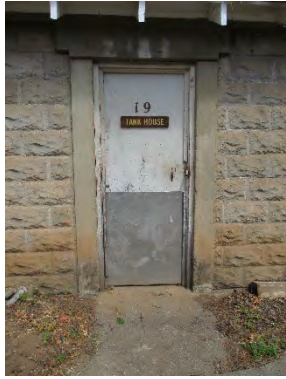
Main door, western elevation of Tankhouse (Pumphouse). Note thick concrete pediment. Photograph taken 6/25/2019.
